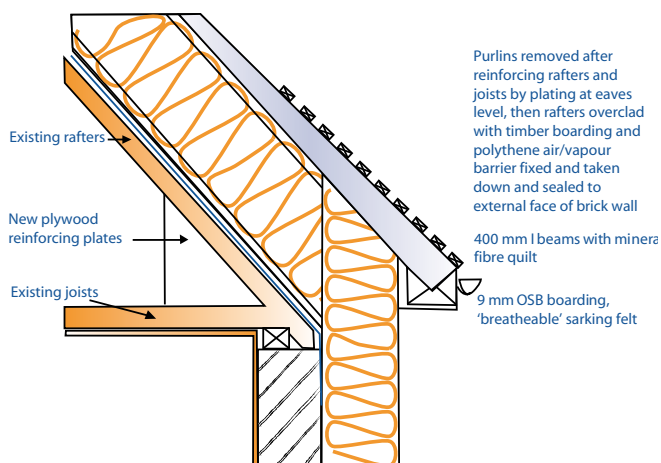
At Grove Cottage, the 400 mm thick roof insulation connects at the eaves to 250 mm thick external wall insulation
